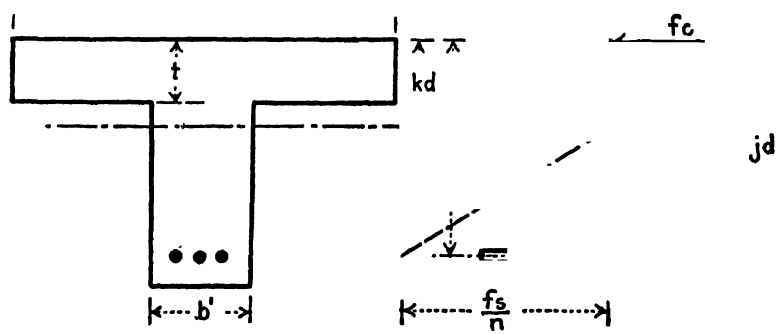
Nomenclature for reinforced concrete T-beam.
